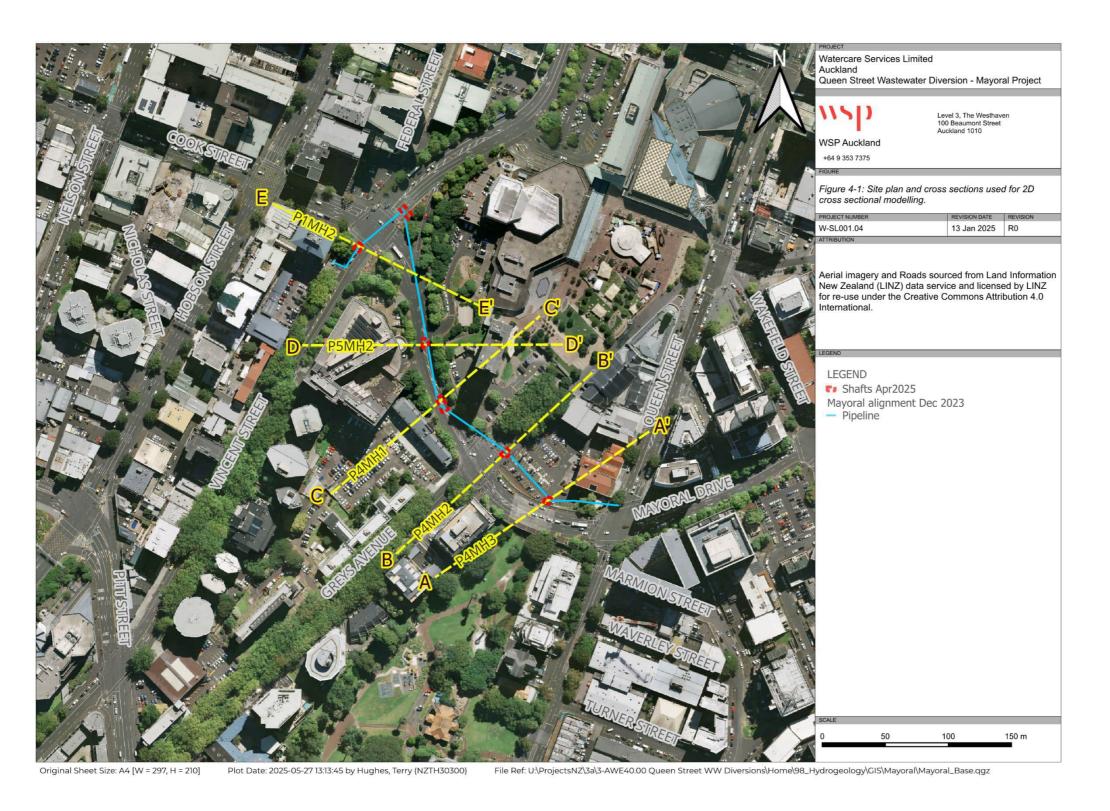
Site plan showing location of site investigations and ground model cross sections (yellow dashed line)
